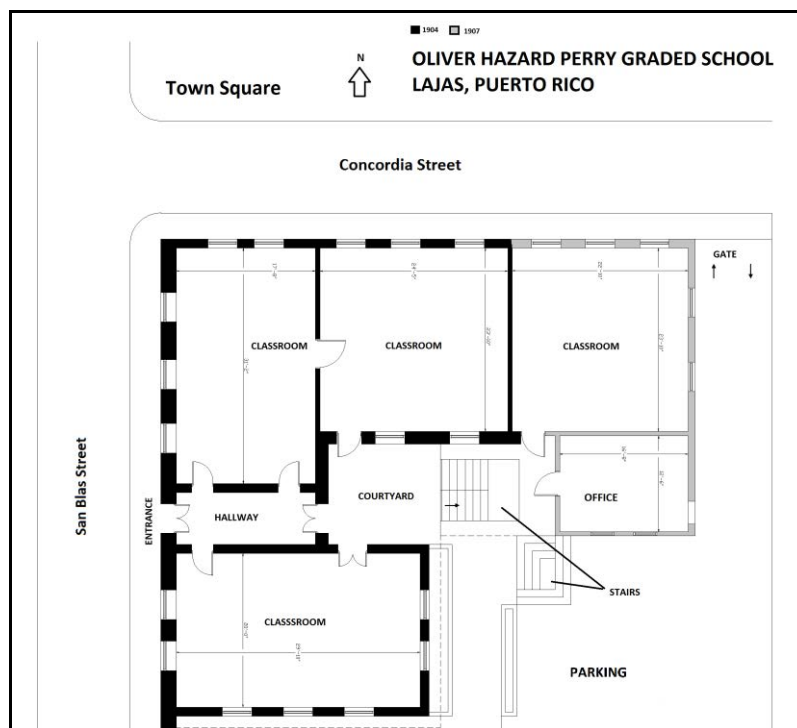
Floor plan of the Oliver Hazard Graded School showing area of 1904 building (black lines) and 1907 addition (grey colored lines).
